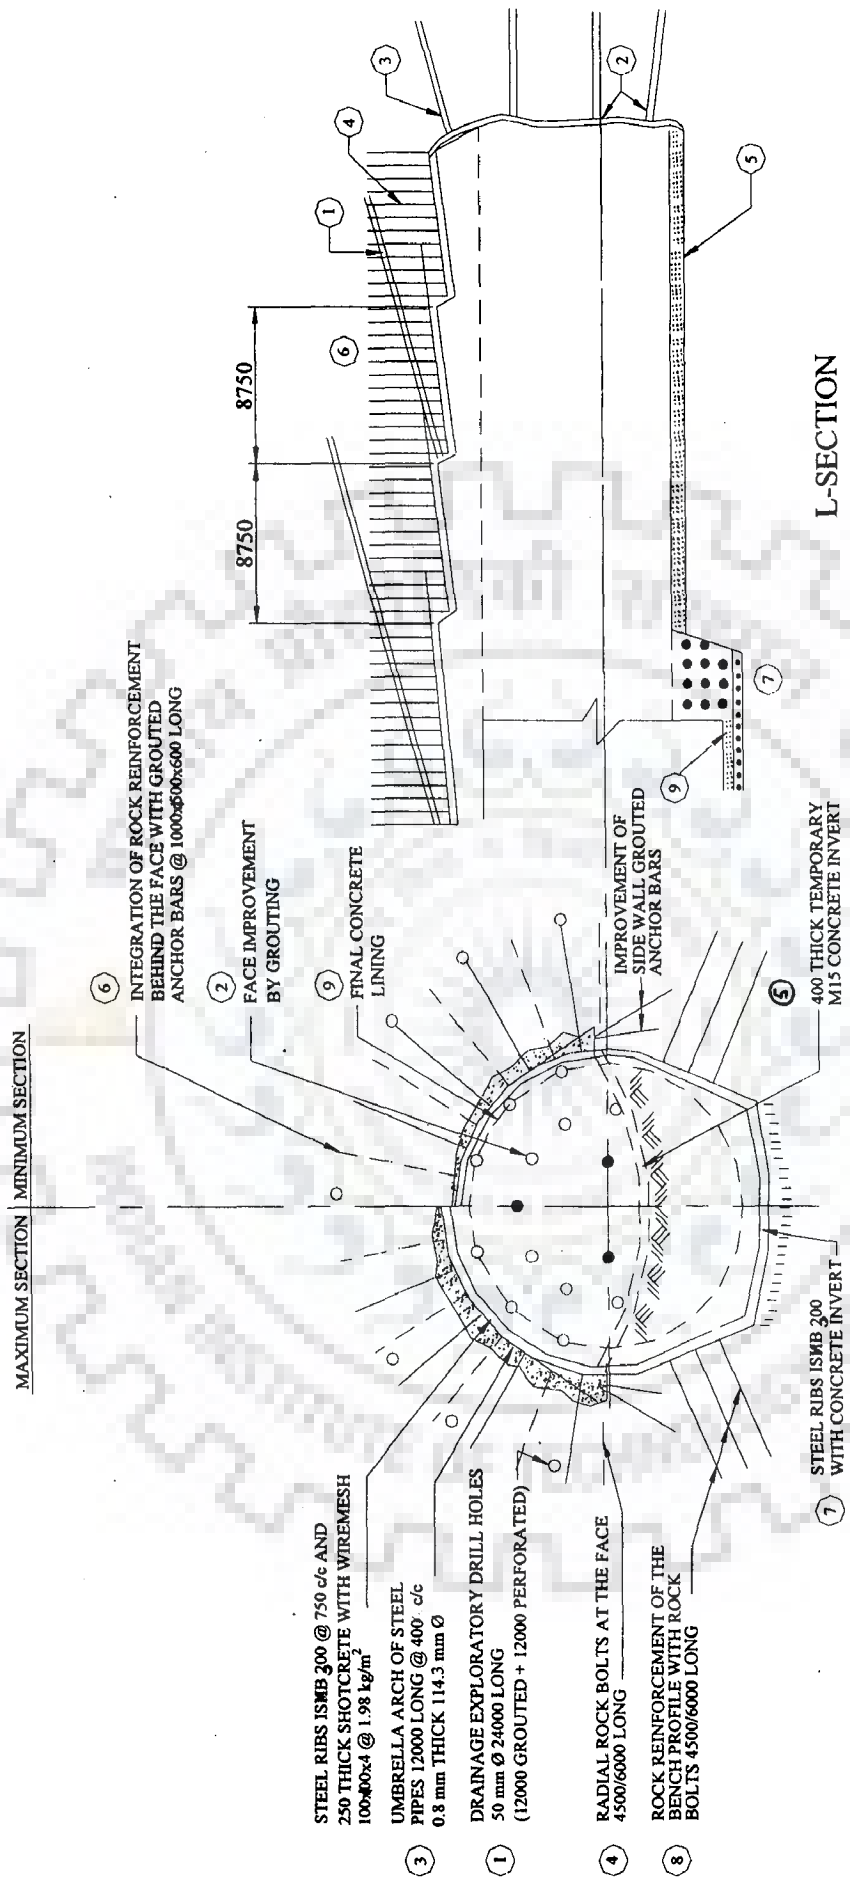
Excavation and supporting system as per DRESS methodology (Class VI)
